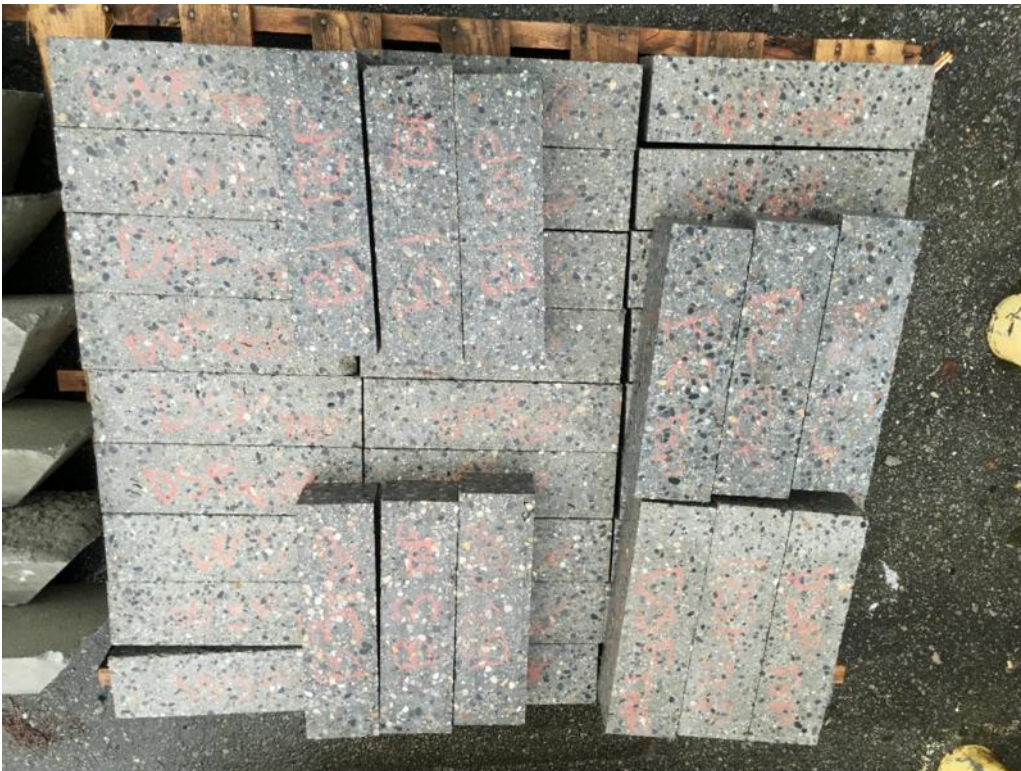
Beams were cut to 100 +/- 2 mm for ASTM C1609 & ASTM C1399 tests
